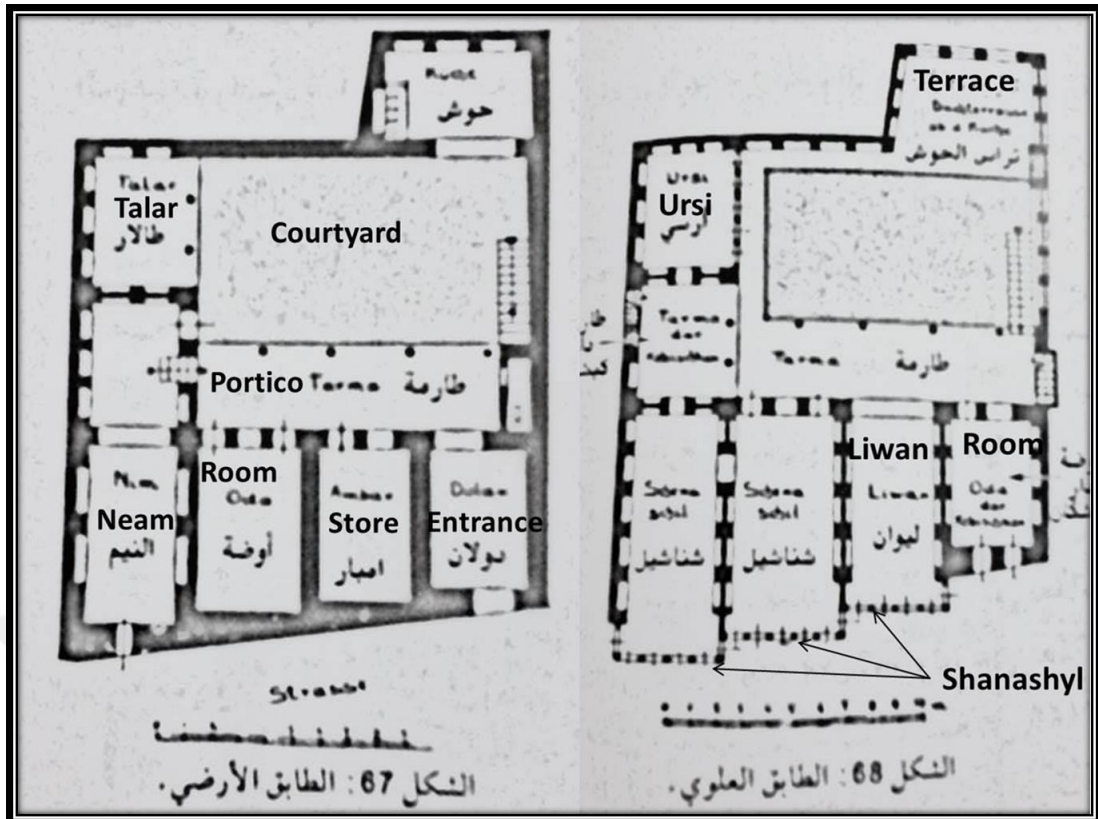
Ground Floor Plan, Showing, Courtyard, Talar, Portico (Tarma), Neam, Room, Store, Entrance, and First Floor Plan Showing, Terrace, Ursi, Portico, Shanashyl, Liwan, and Rooms [152].
